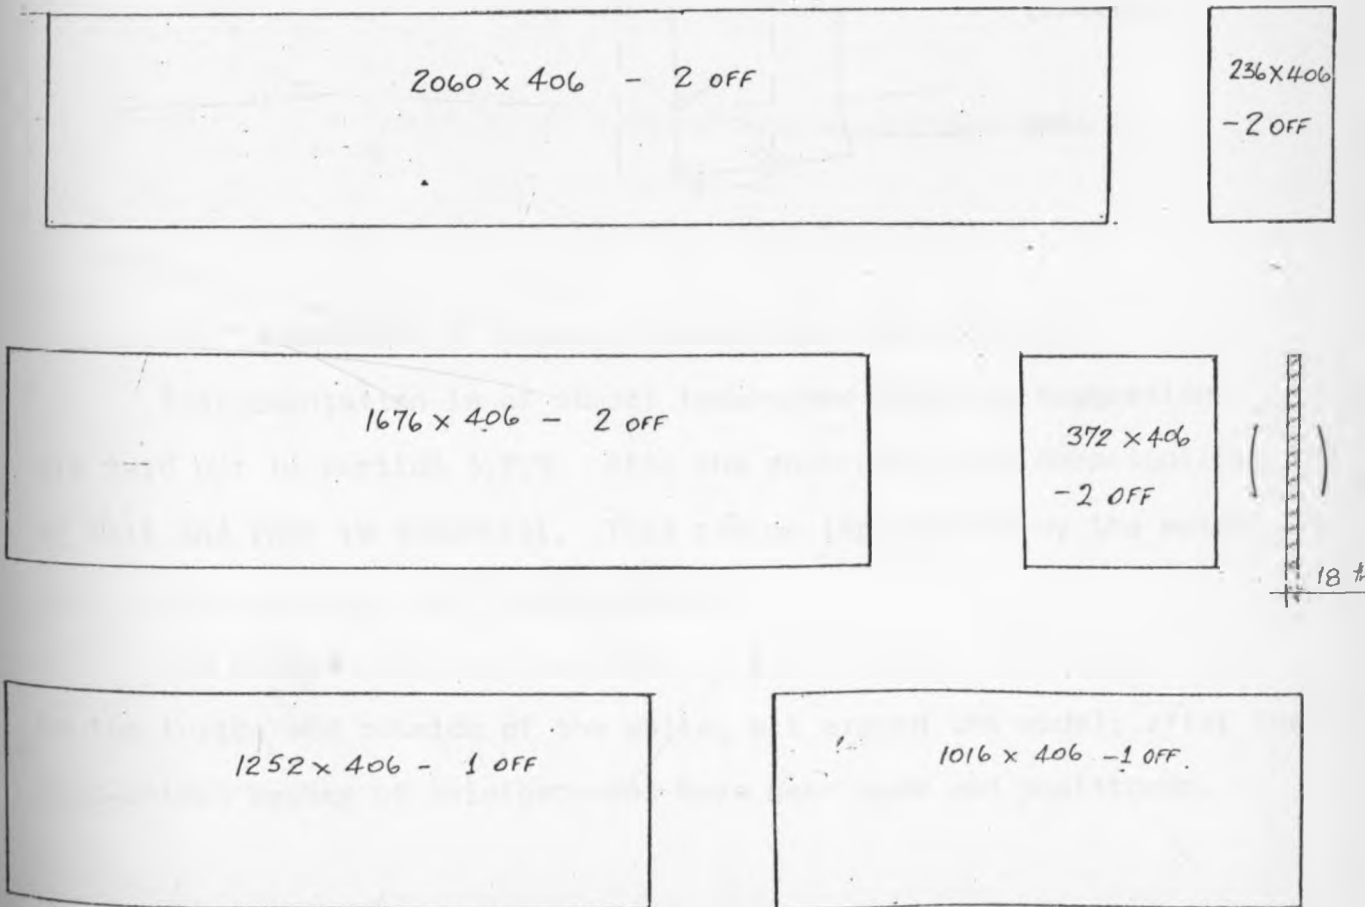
Boards for Stage 4 Formwork (all 18mm thick)
